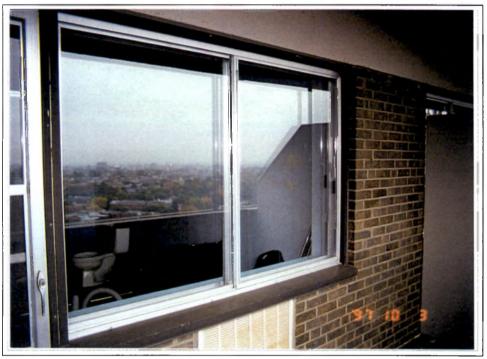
Exterior view of aluminum sliding window at the L'Emminence apartment
